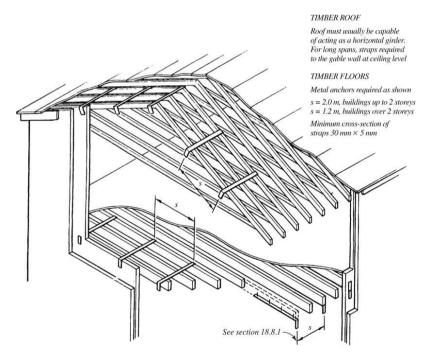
Means of providing lateral restraint to external brick/block cavity walls.
